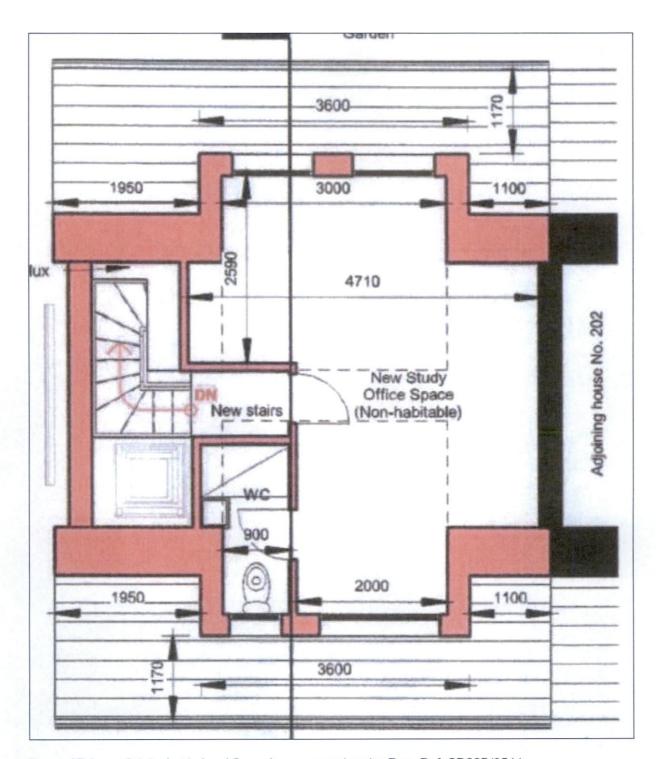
Original attic level floor plan proposed under Reg. Ref. SD22B/0544.
